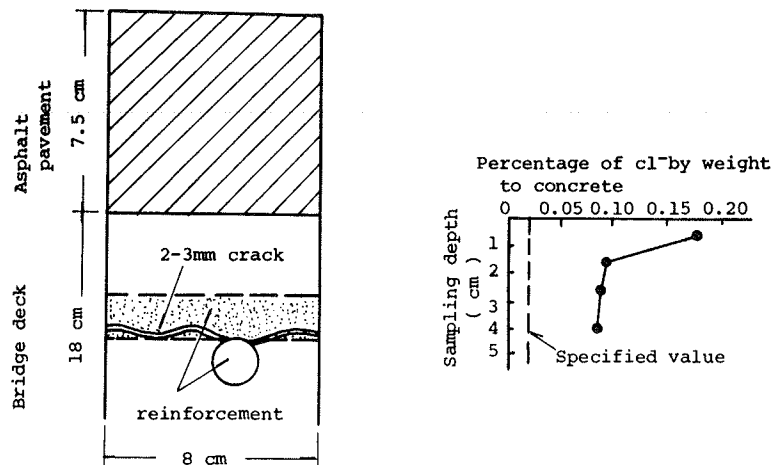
Cl<sup>-</sup> content of concrete core of actual bridge deck and crack caused by corrosion of reinforcement.
